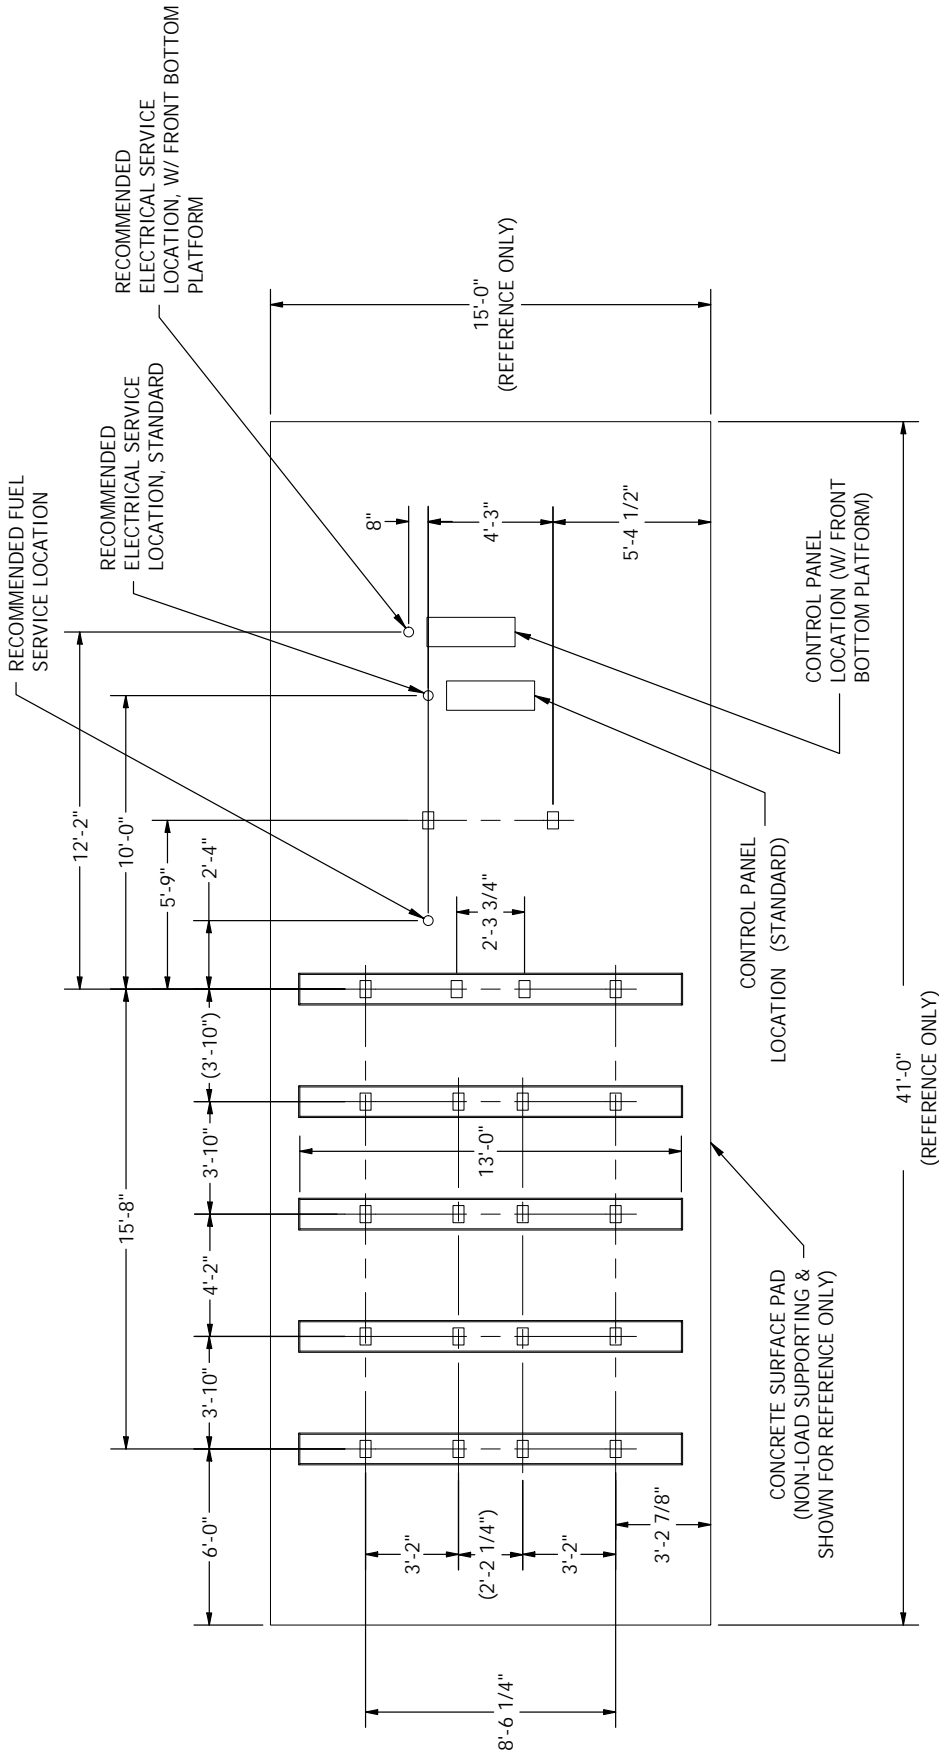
Load Point (Anchor Legs) Layout for Dryer Models D24108, D24150, and D24180
